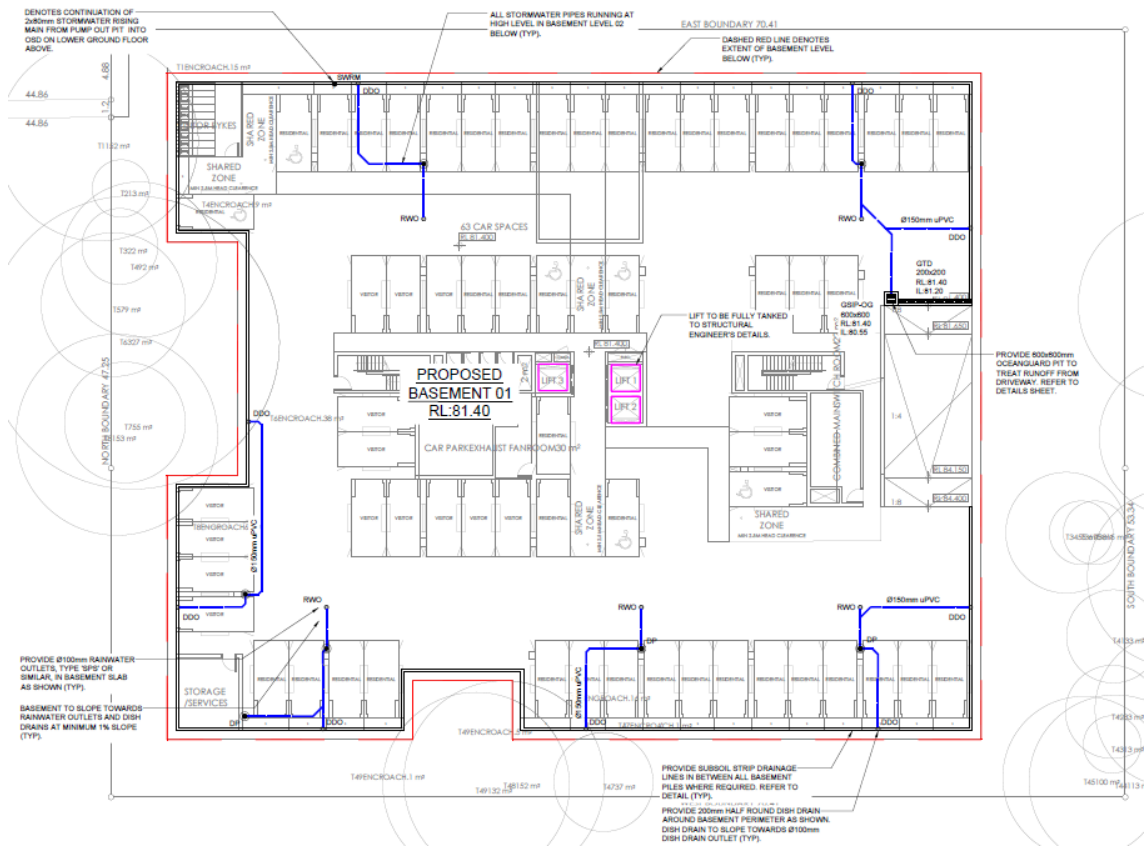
Basement 01 Stormwater Plan (Source: GEBA Consulting)
